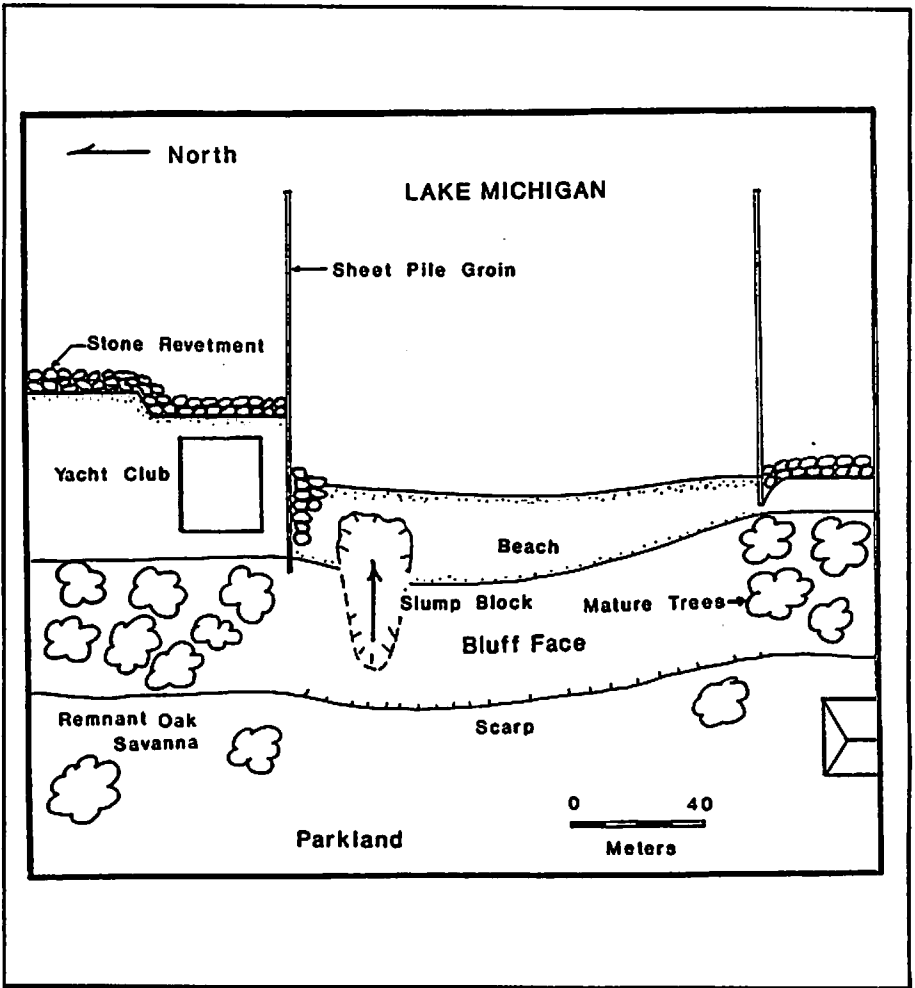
Plan view: site conditions Sunrise Park and Beach, Lake Bluff, Ill.
